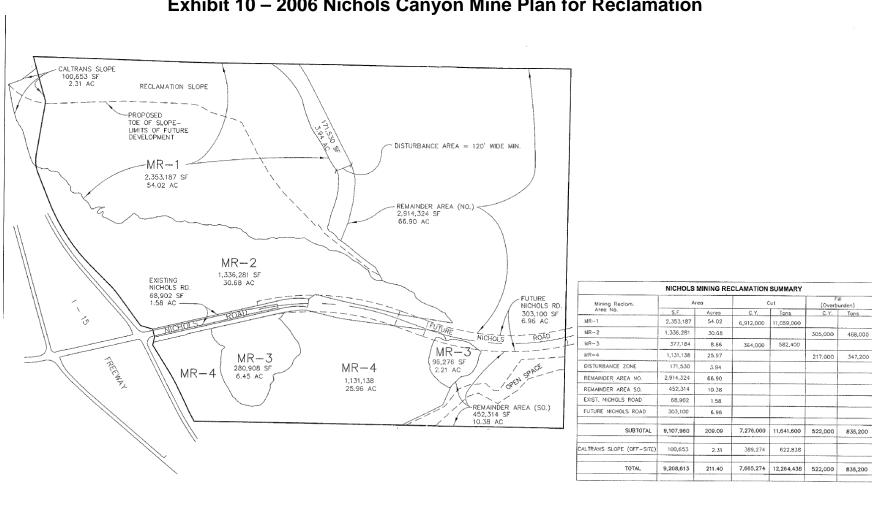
2006 Nichols Canyon Mine Plan for Reclamation
